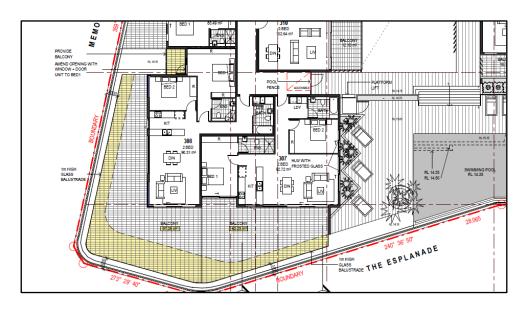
| Original proposed modifications to Level 3 (Source: Applicant's Application)
